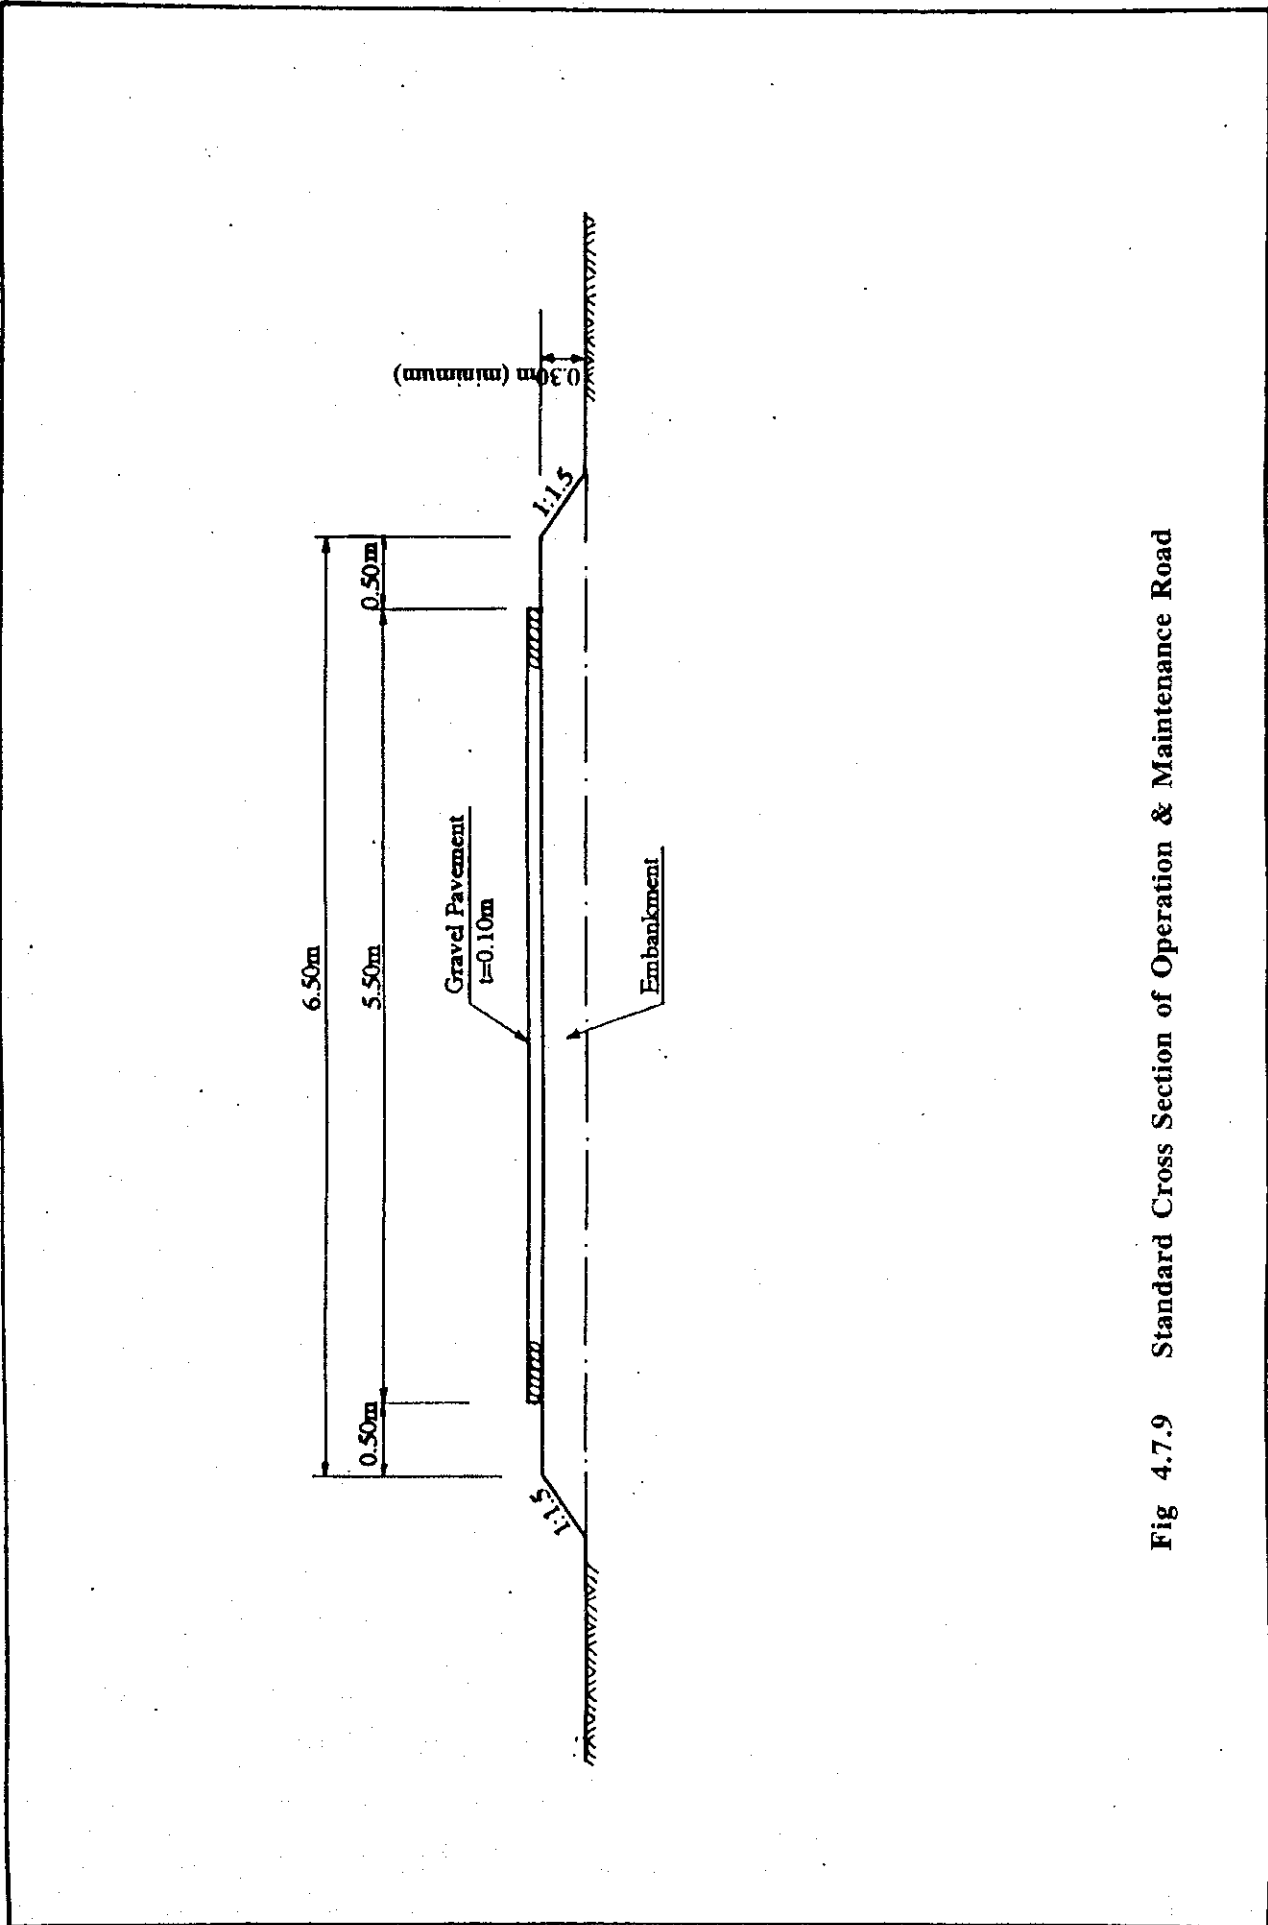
Standard Cross Section of Operation & Maintenance Road
